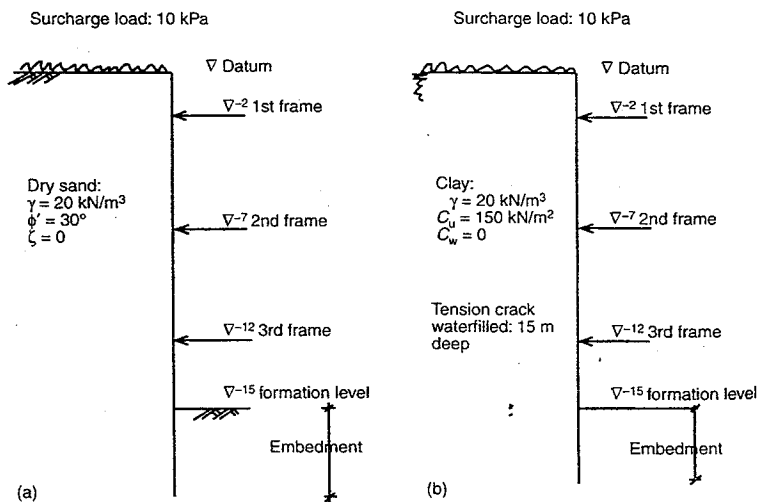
Multi-braced walls: geometry and soil properties used in analysis for (a) when in sand; and (b) when in clay
